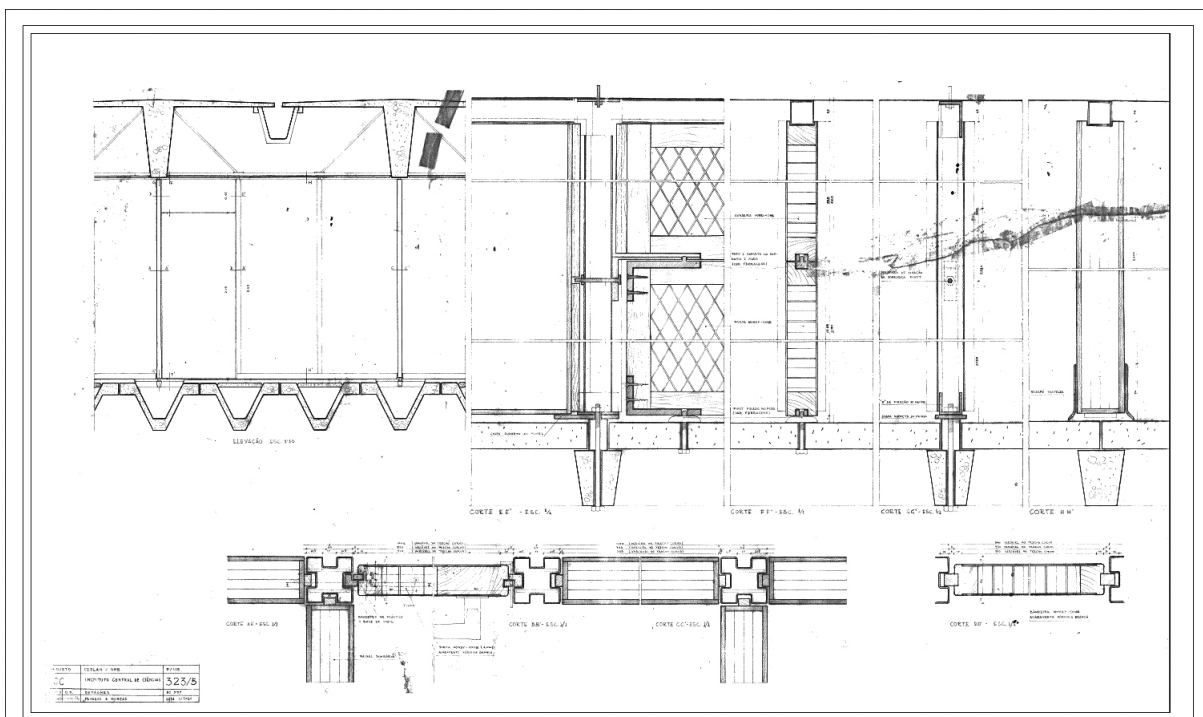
Design for the panels and doors frames showing details of the metallic stanchions (below). Central Institute of Sciences building (ICC). Oscar Niemeyer, J. Filgueiras Lima, 1962. Detail no. 597, drawing board no. 323/5, July 1, 1964. Arquivo CEPLAN, Brasília
